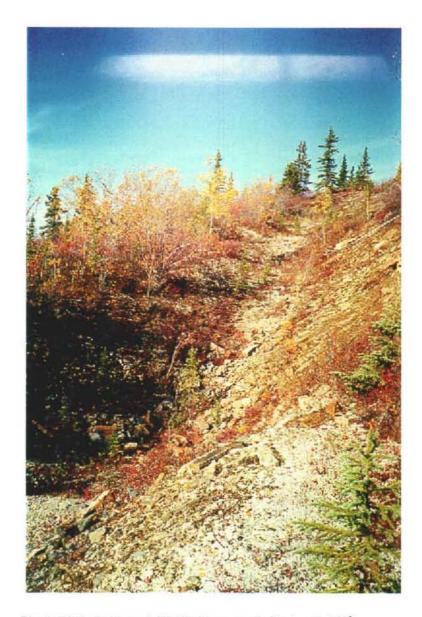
Cat trench TR03 above road. (Azimuth 340°)
